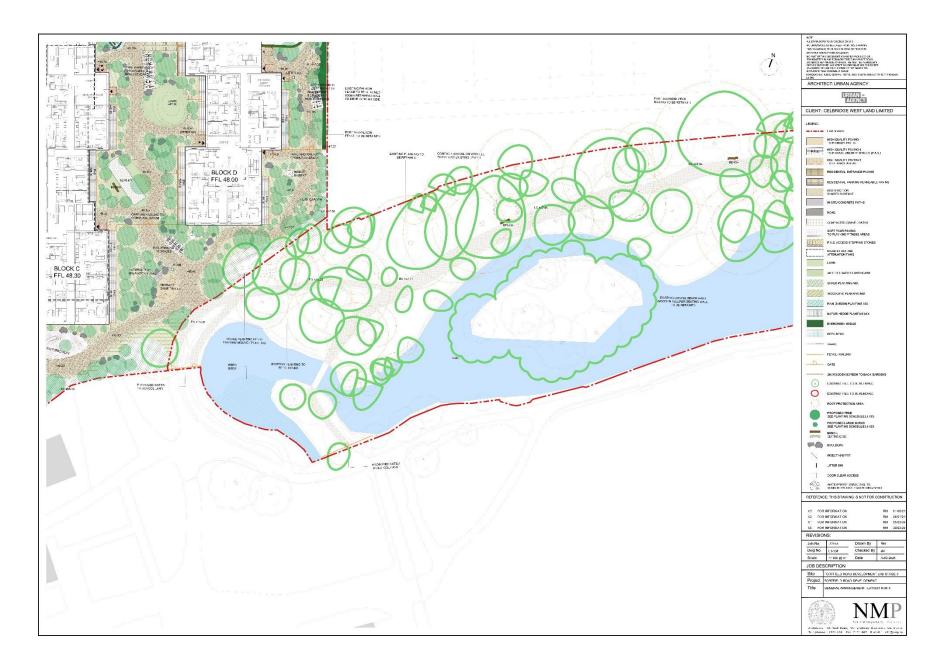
Landscape General Arrangements Plan (Sheet 5 of 6)
